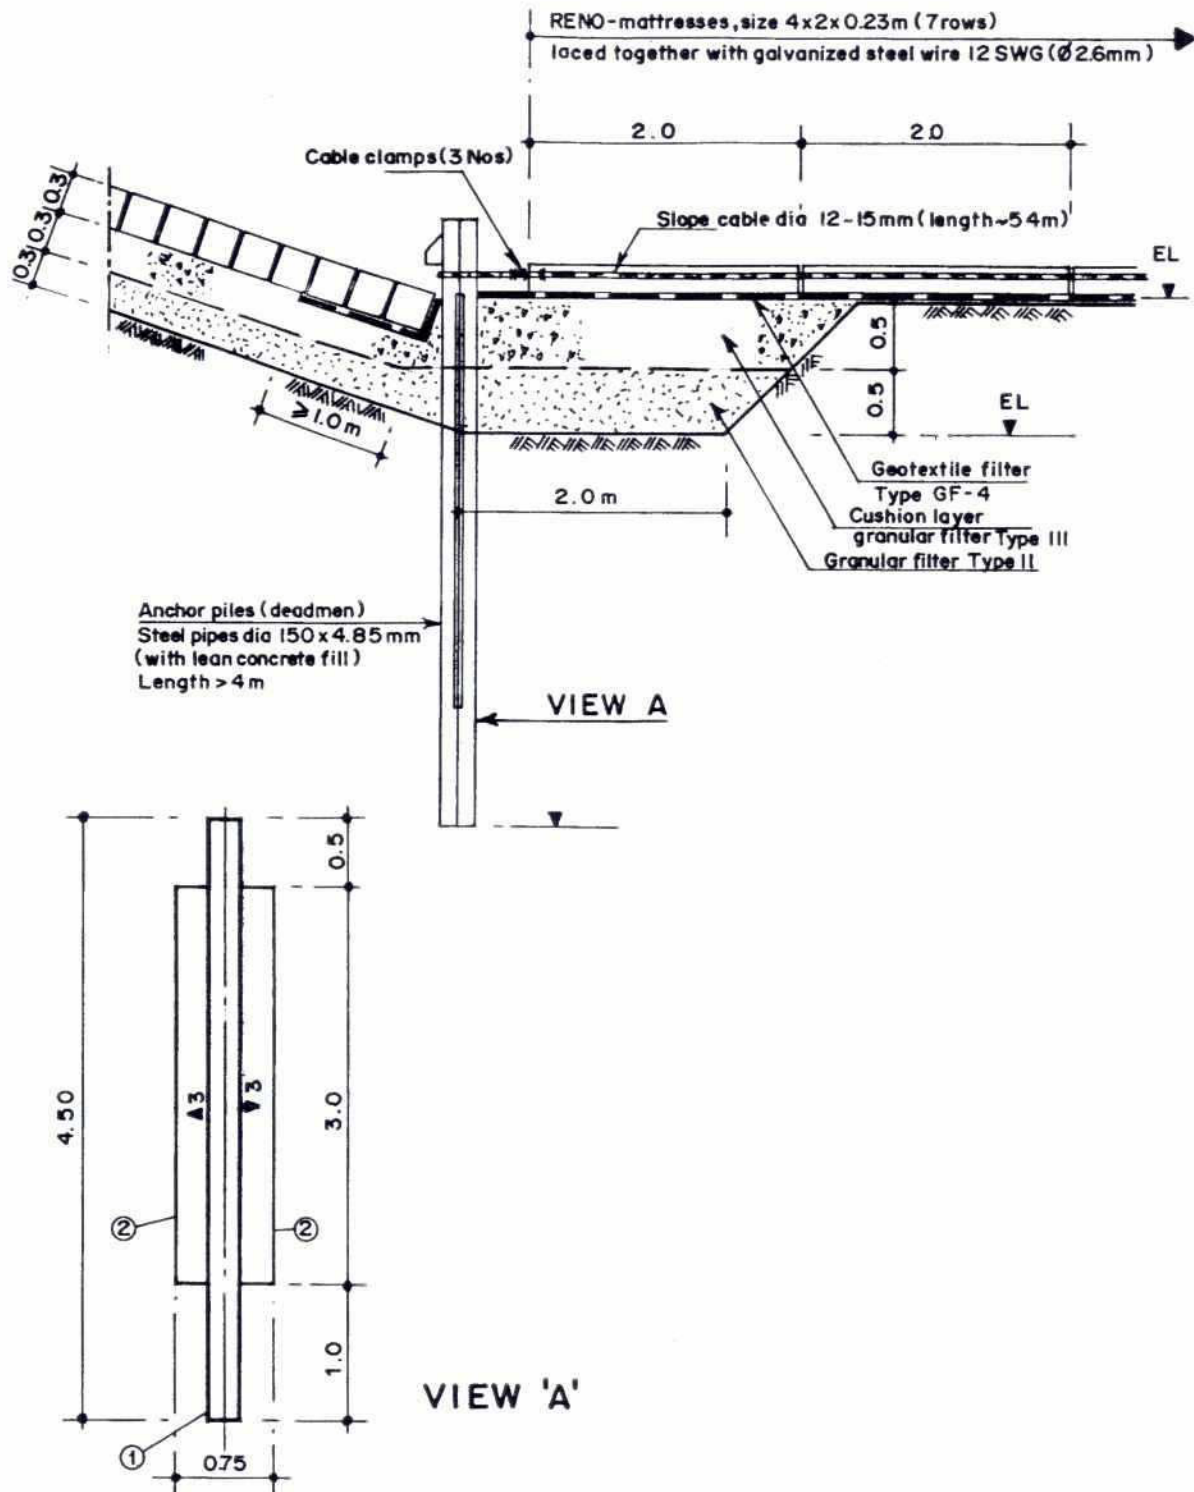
Articulating Reno-mattresses typical shore sided anchorage
